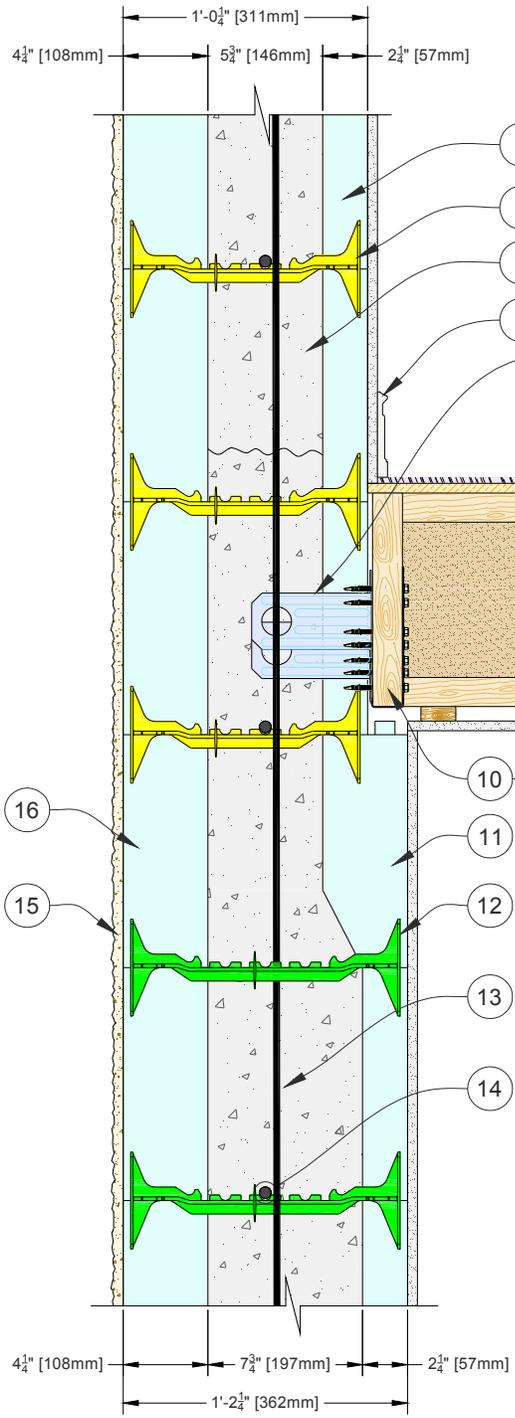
Installation of Floor Ledger with ICFVL Bracket System
